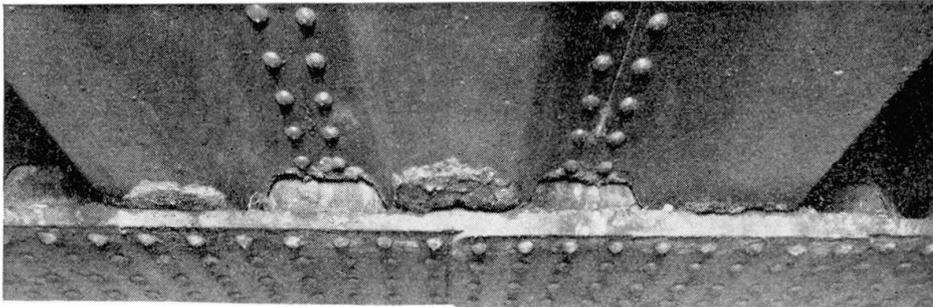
The failure of the connection between transverse pressed steel troughing and a main girder
